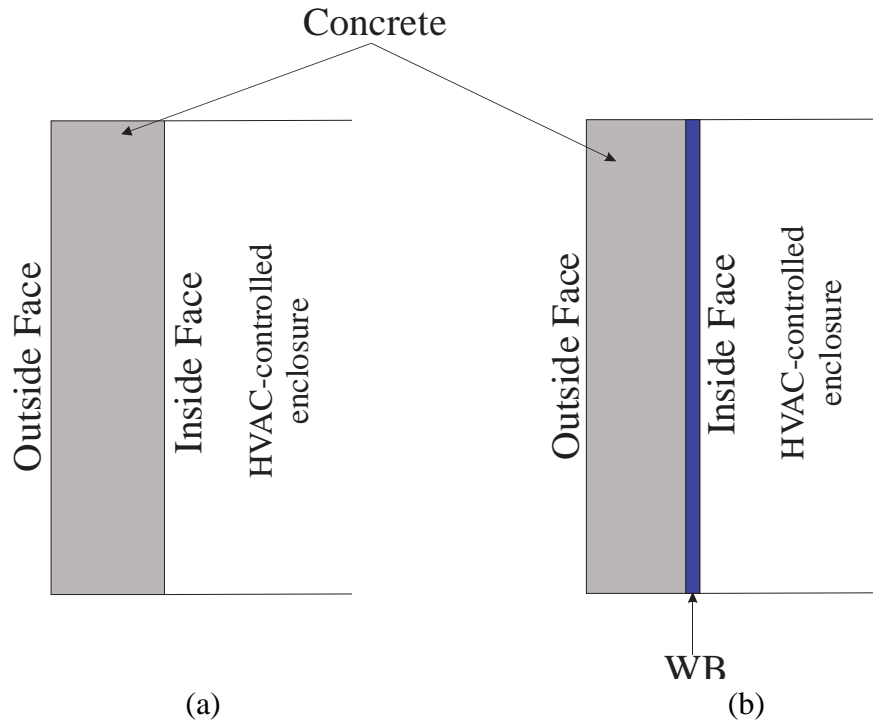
(a) Plain concrete wall (b) Concrete wall with centrally placed gypsum WB
